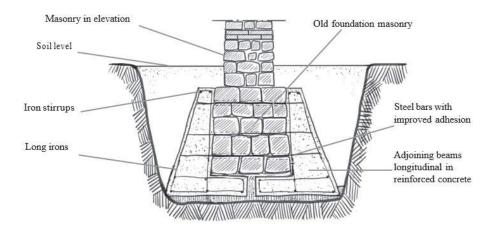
Rehabilitation of the foundation by reinforcing work with concrete beams
